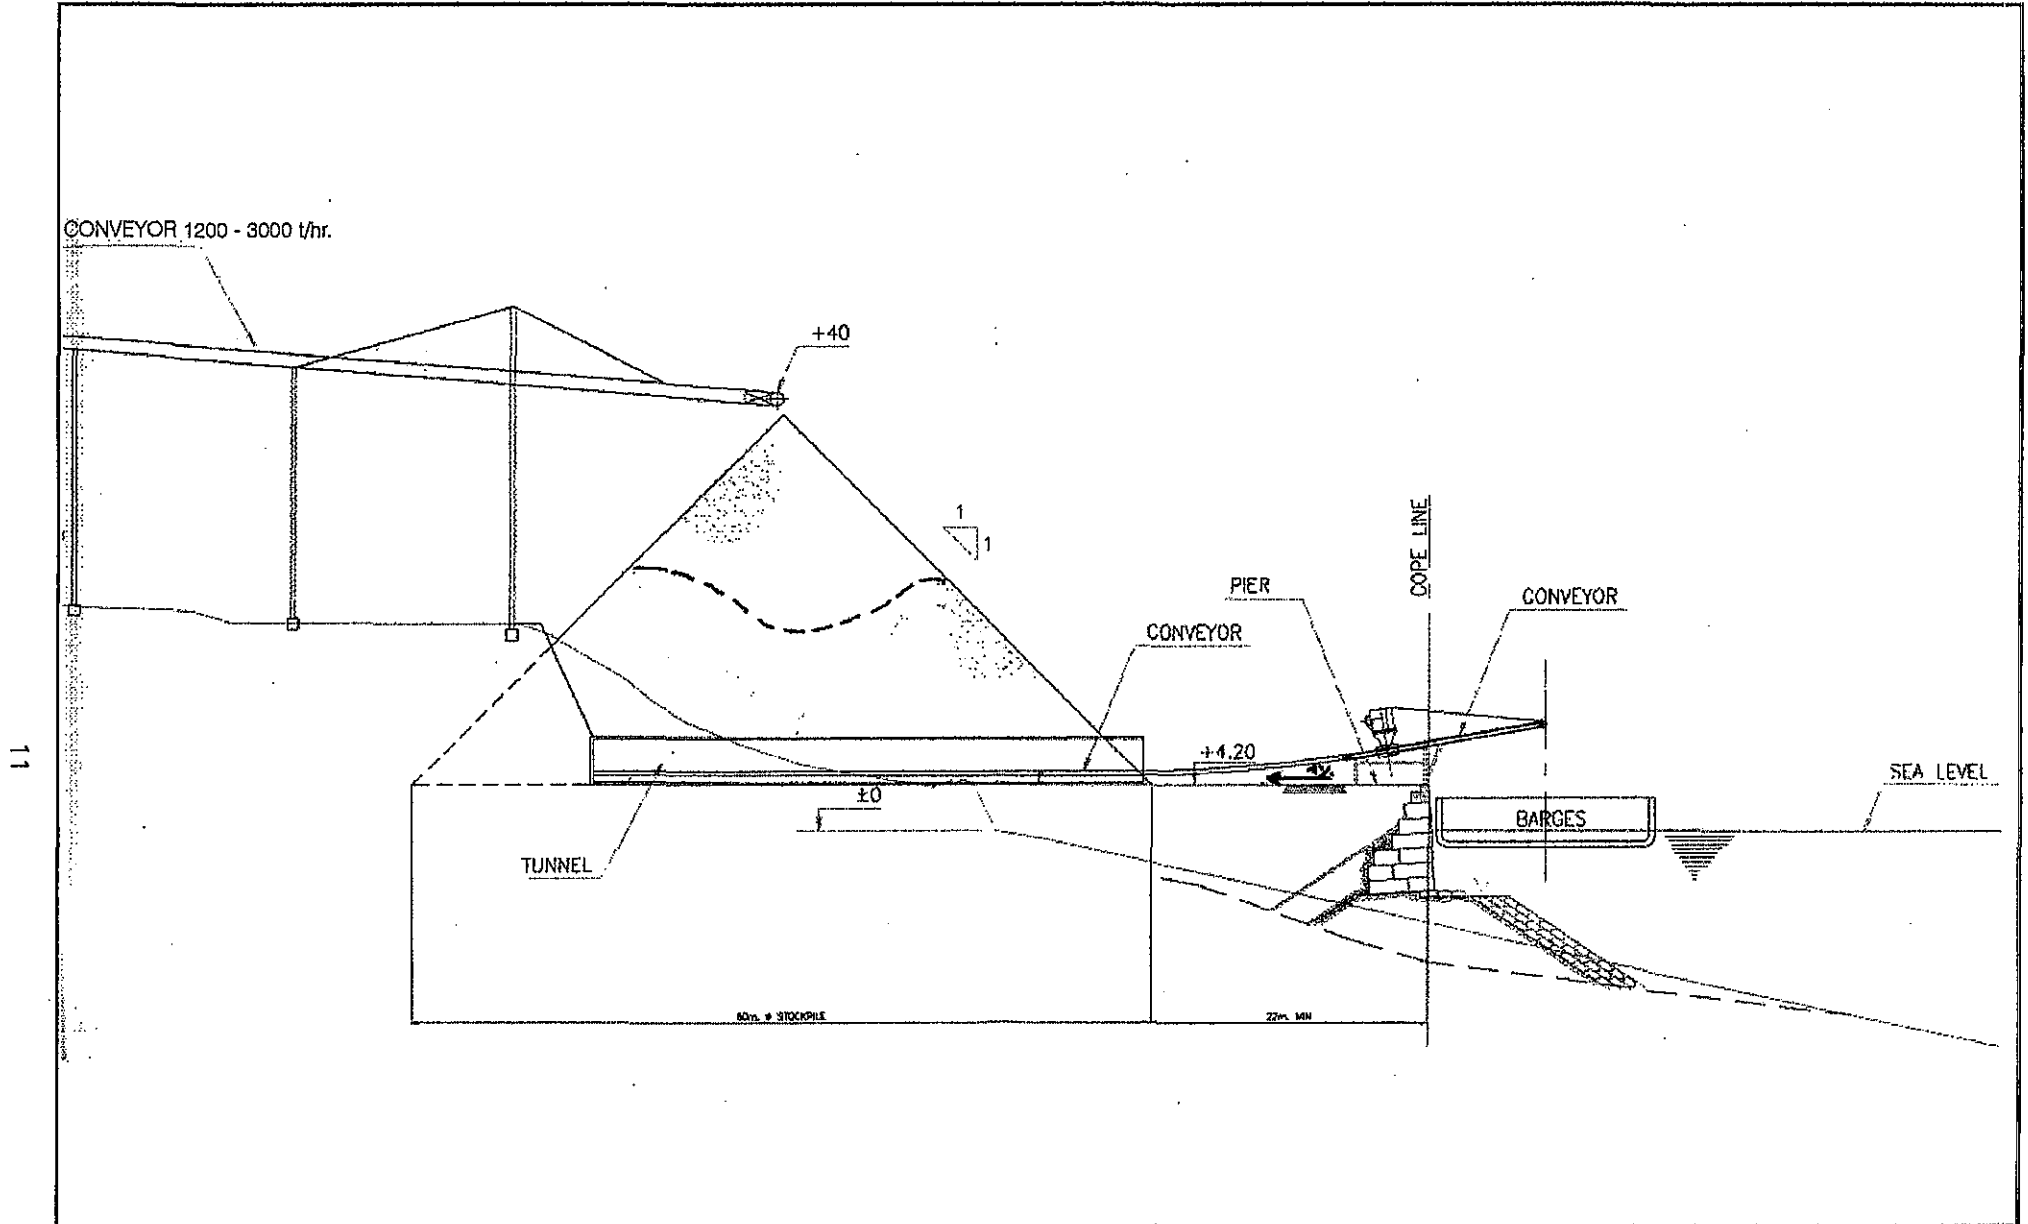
Cross-Section Through Jetty Showing Conveyor Arrangement
